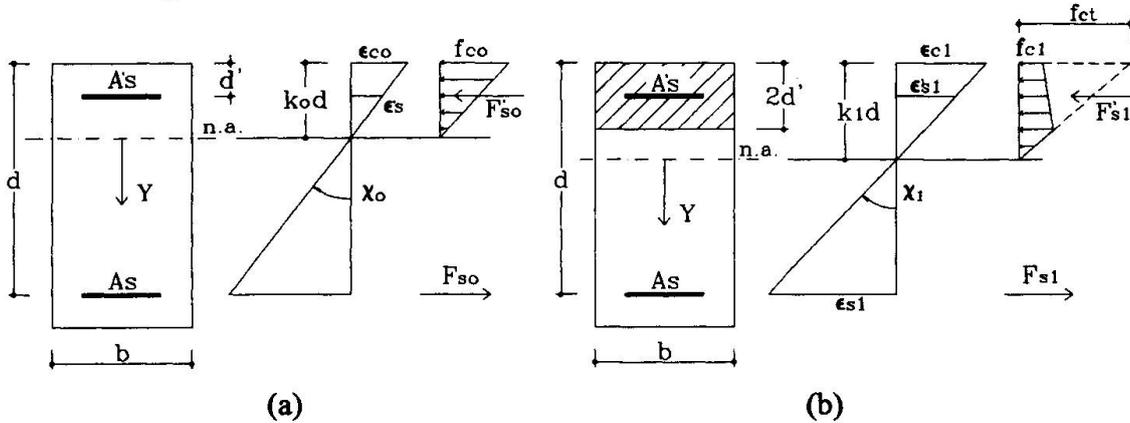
(a) Undamaged section ; (b) Damaged section
